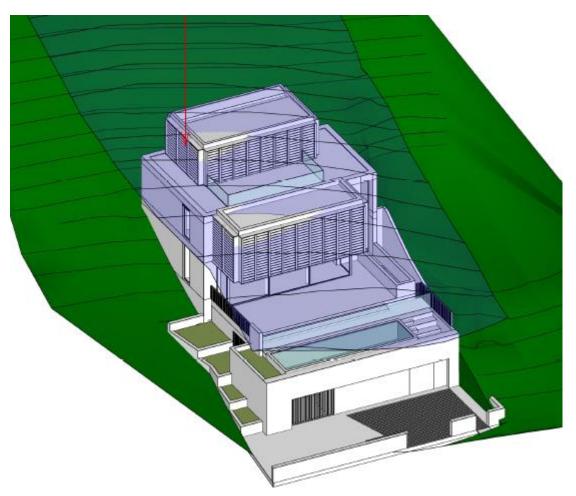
Plan extract DA10(E) showing the minor building elements breaching the 8.5 metre building height standard
